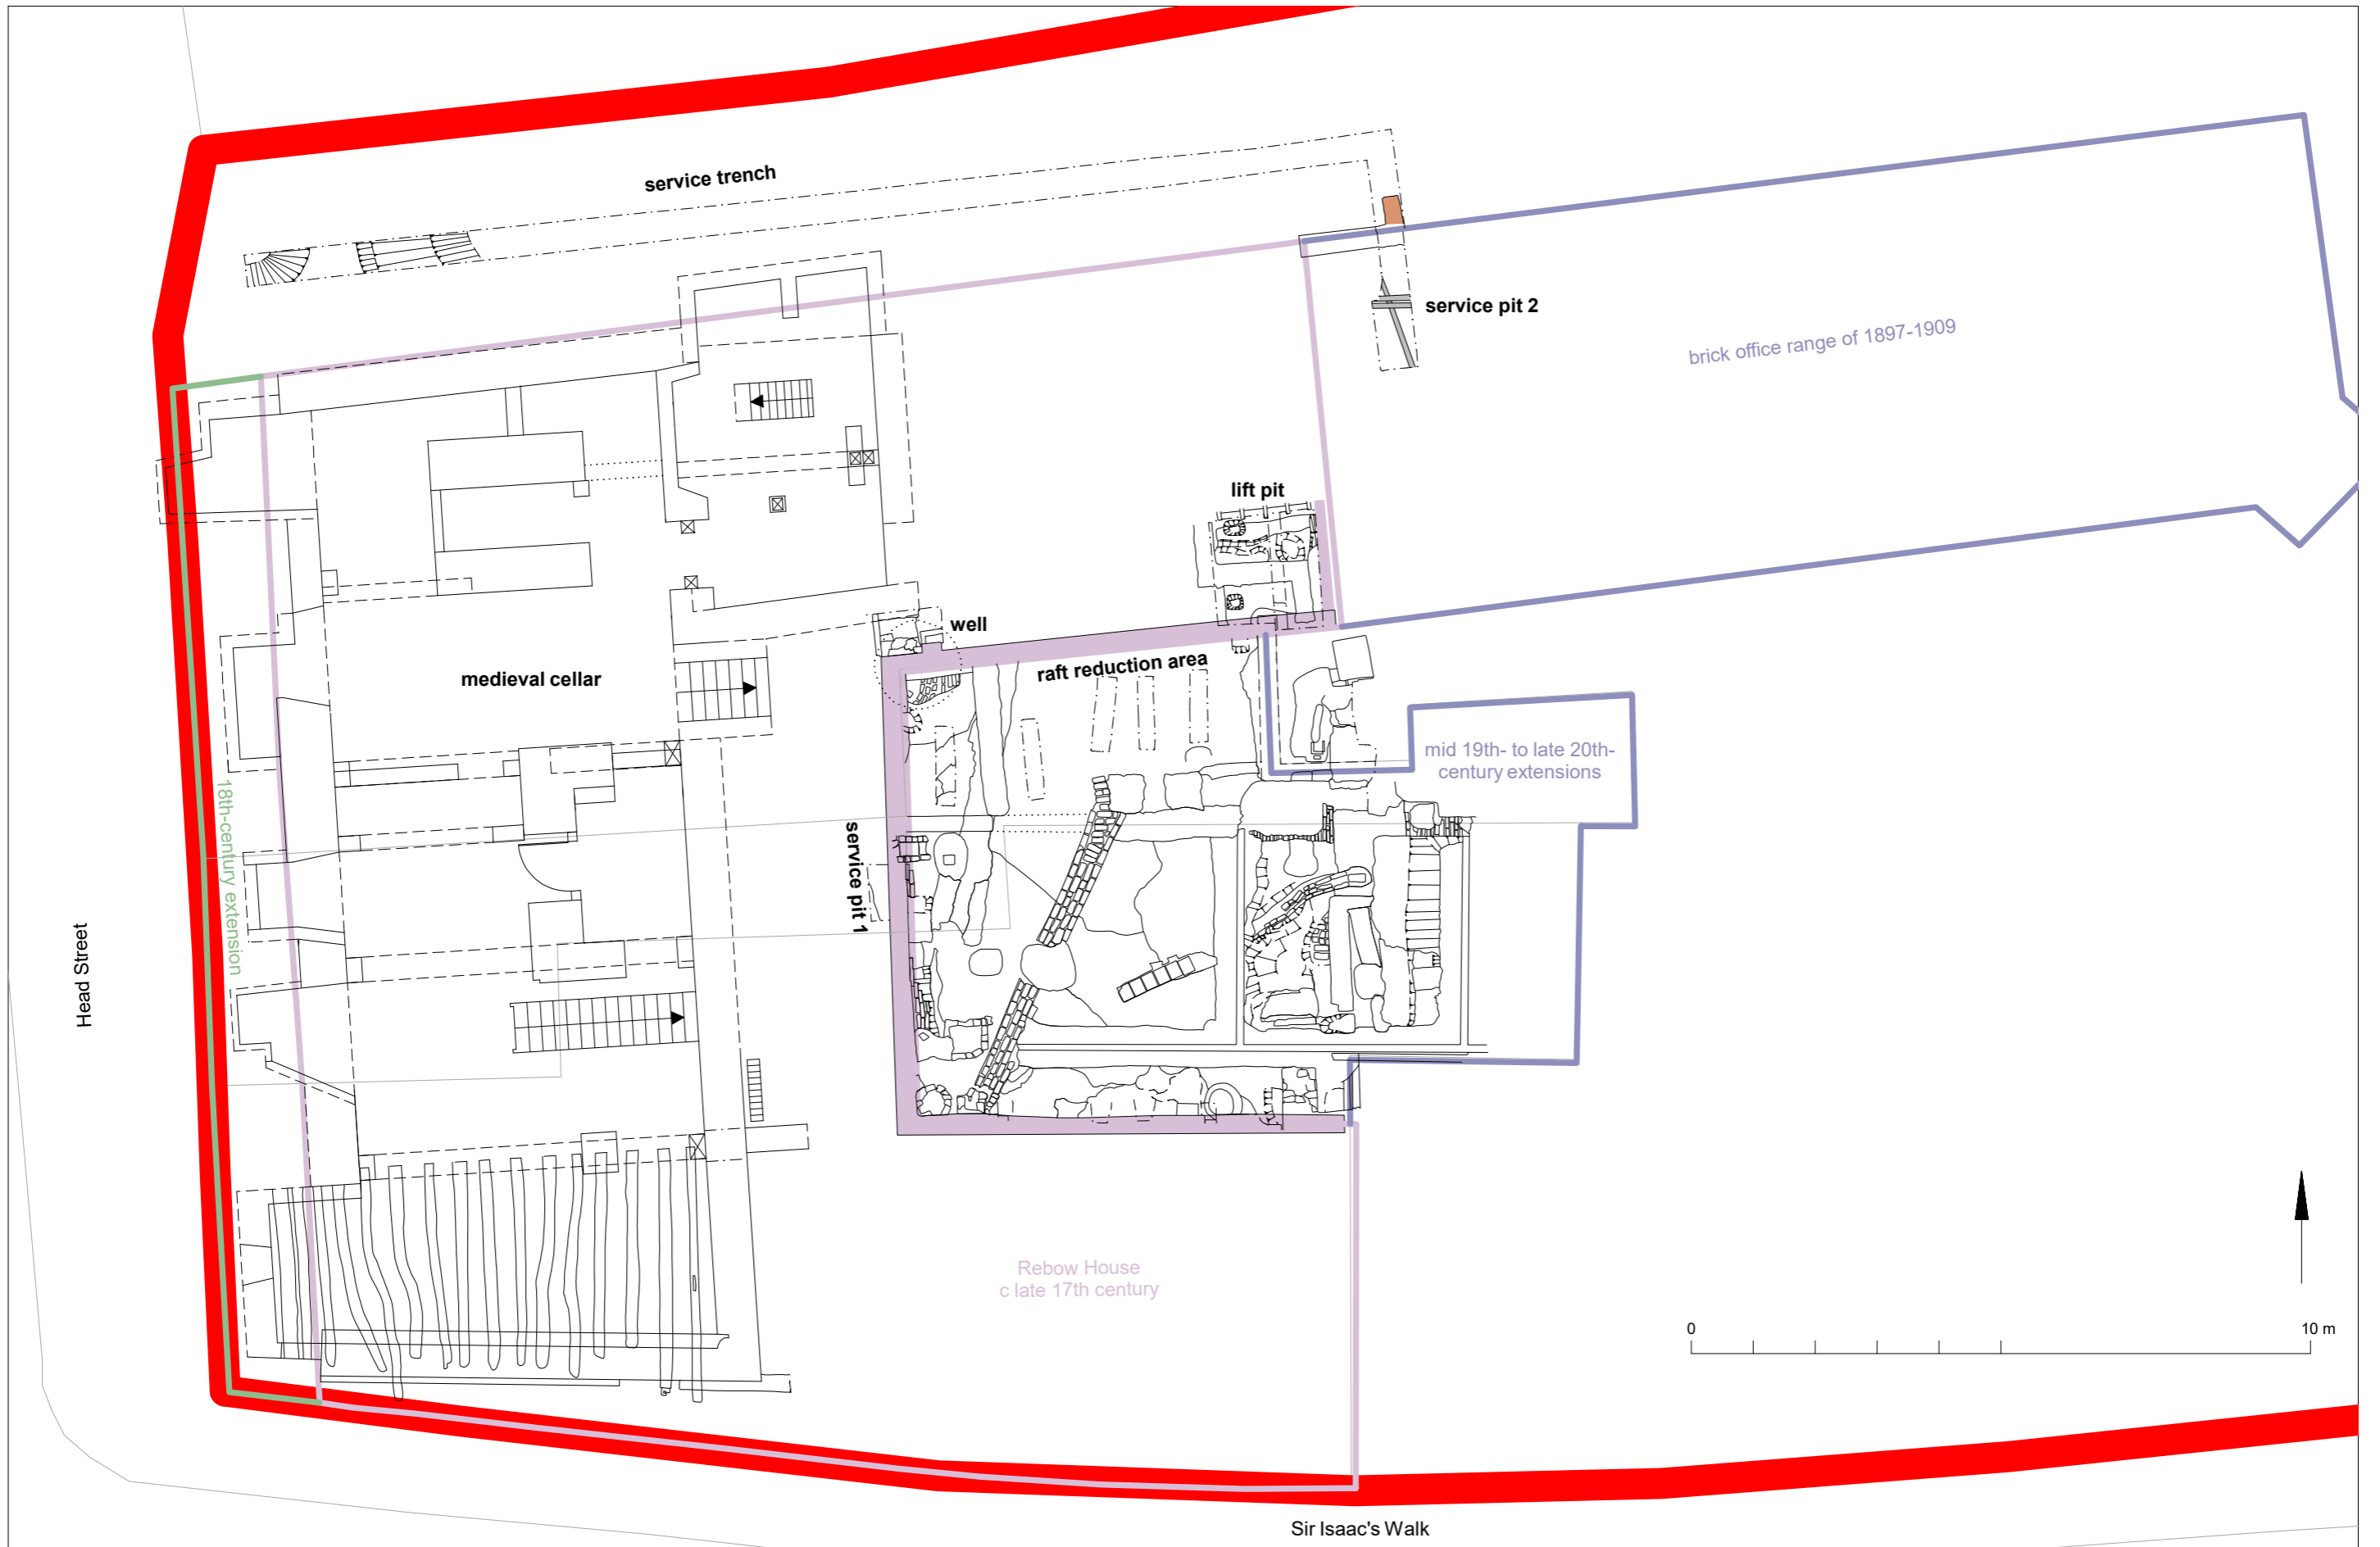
Plan of Rebow House showing the location of the medieval cellar and areas of monitoring.
